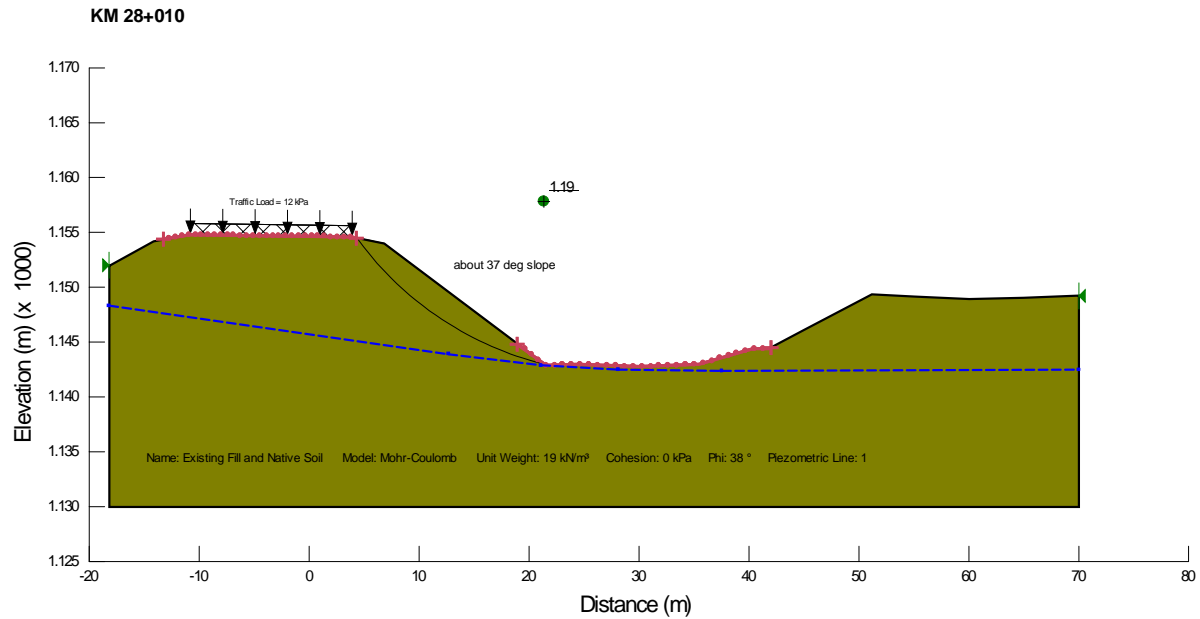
Station 28+010 - Global Stability of the Existing Slope
